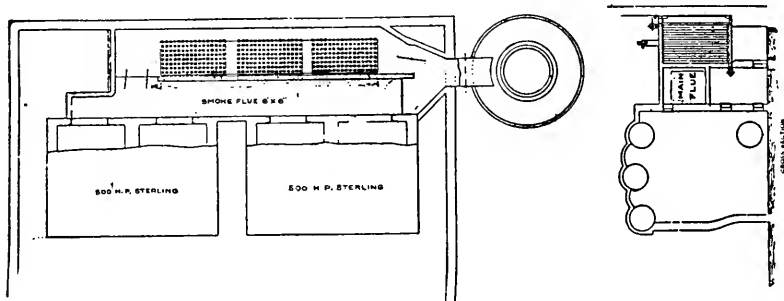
LAYOUT OF A TYPICAL BOILER PLANT SHOWING INSTALLATION OF ECONOMIZERS AT REAR OF SETTINGS
